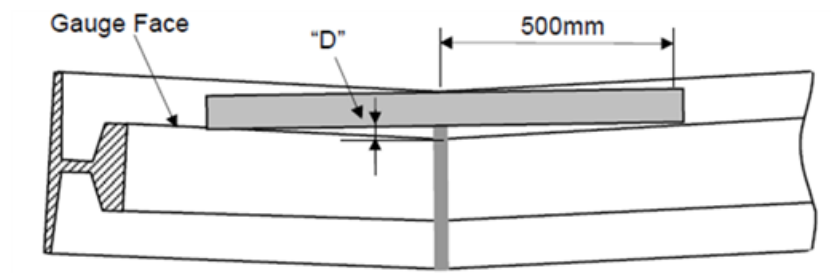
Weld misalignment tolerance in horizontal plane (widening)
